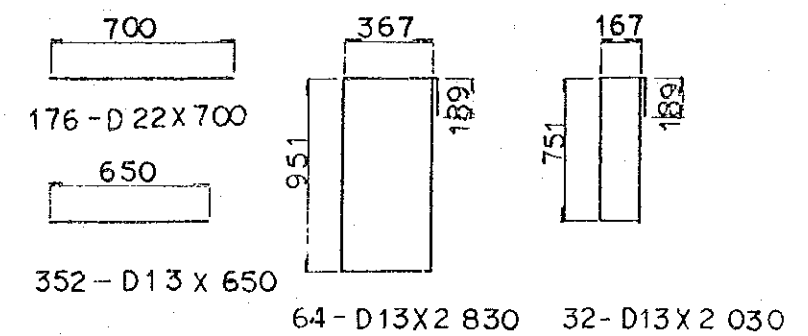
Reinforcement of Cross Beam for Bridge No. 7 and No. 9 in Detail
